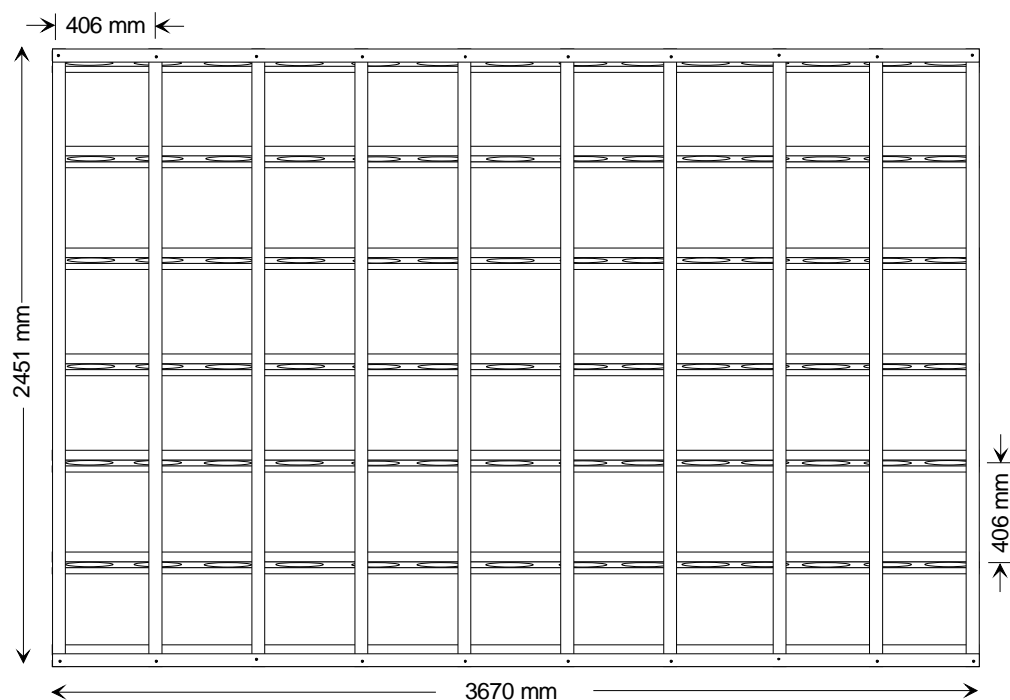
Sketch of the steel stud and resilient channel location for most load-bearing steel-framed specimens constructed in this project, with the studs spaced 406 mm o.c. and resilient metal channels spaced 406 mm o.c. The fasteners securing the studs to the track and the resilient channels to the studs were 19 mm low-profile self-drilling # 10 screws.
